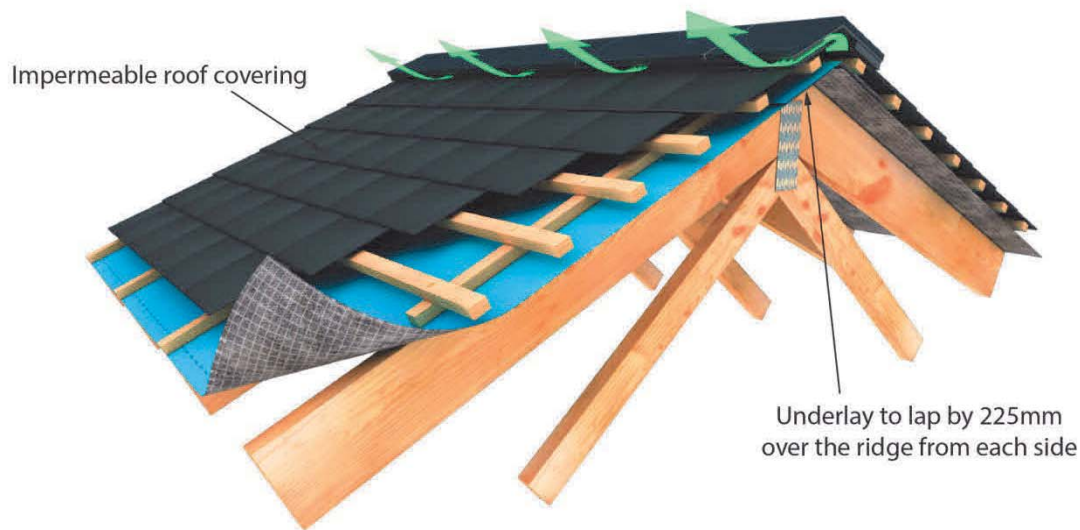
Cold Roof detail with impermeable roof covering - Ridge Detail
